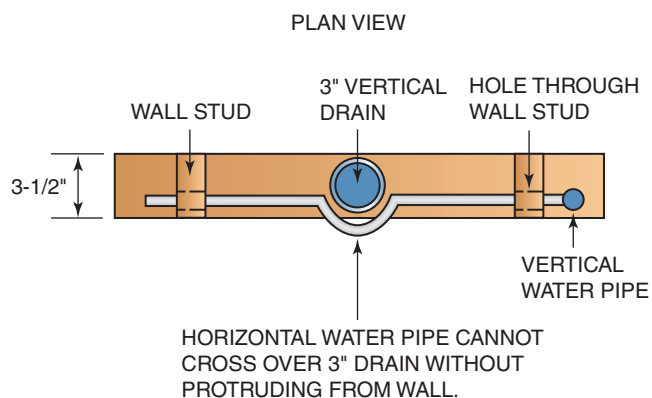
A 3" pipe installed in a 2" x 4" wall does not leave enough room for a horizontal water pipe.
